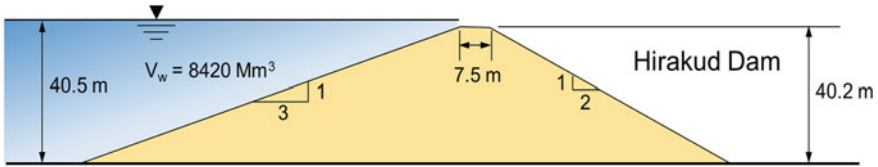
Cross-section of Hirakud Dam earthen embankment where breaching occurs
